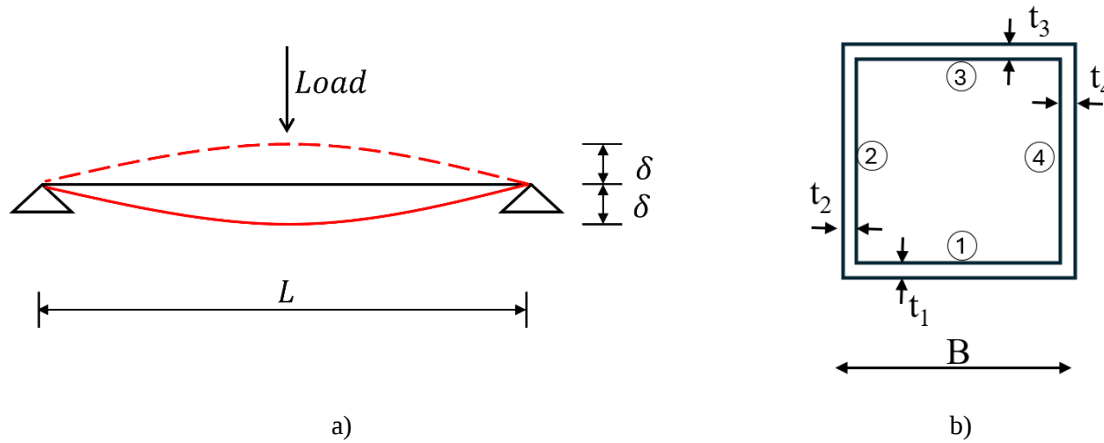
a) Scheme of Loading Test. b) Cross-Section Geometry.
